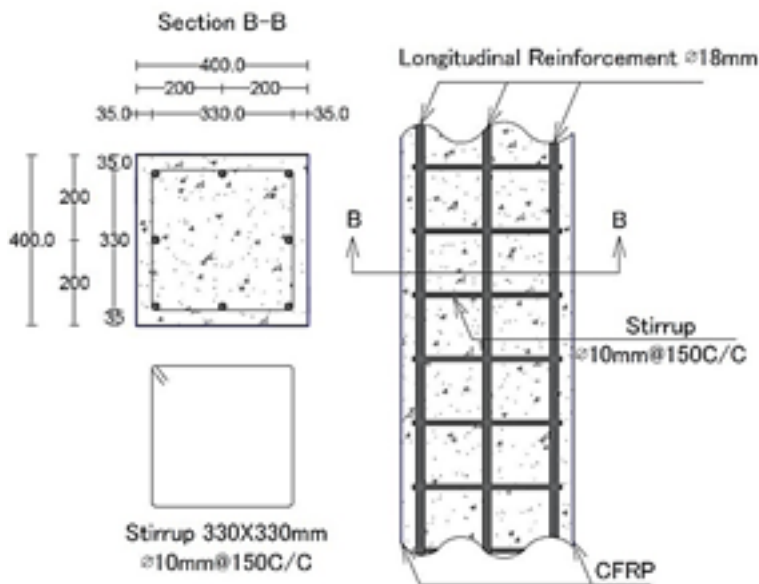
Geometry and reinforcement details of FRP-wrapped column
